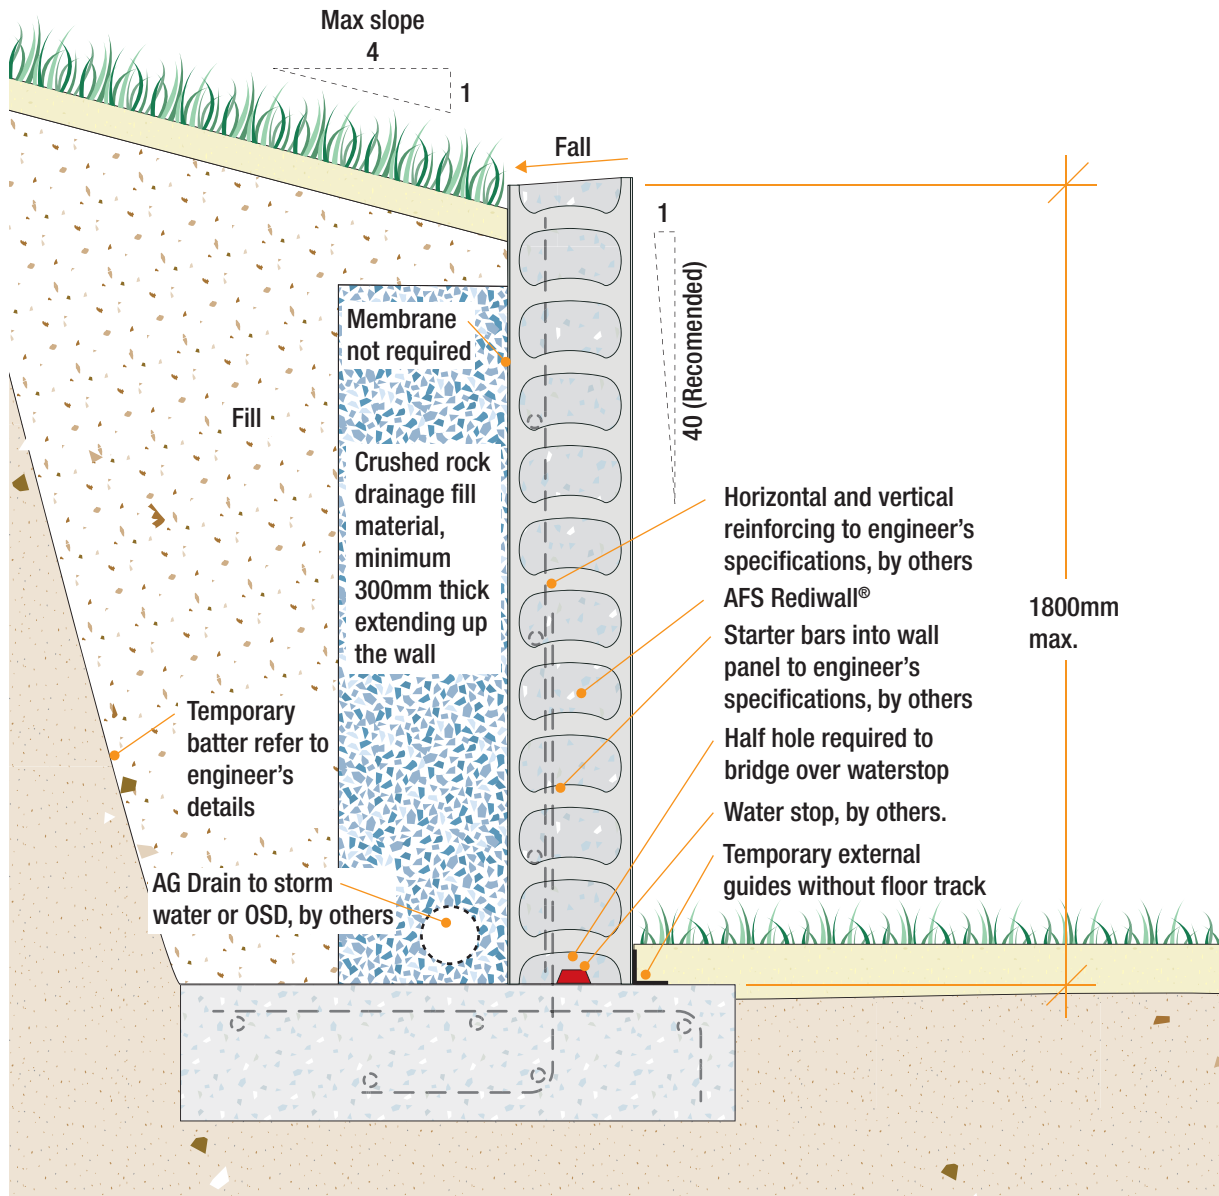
Cantilevered Retaining Wall (maximum height 1800mm)
